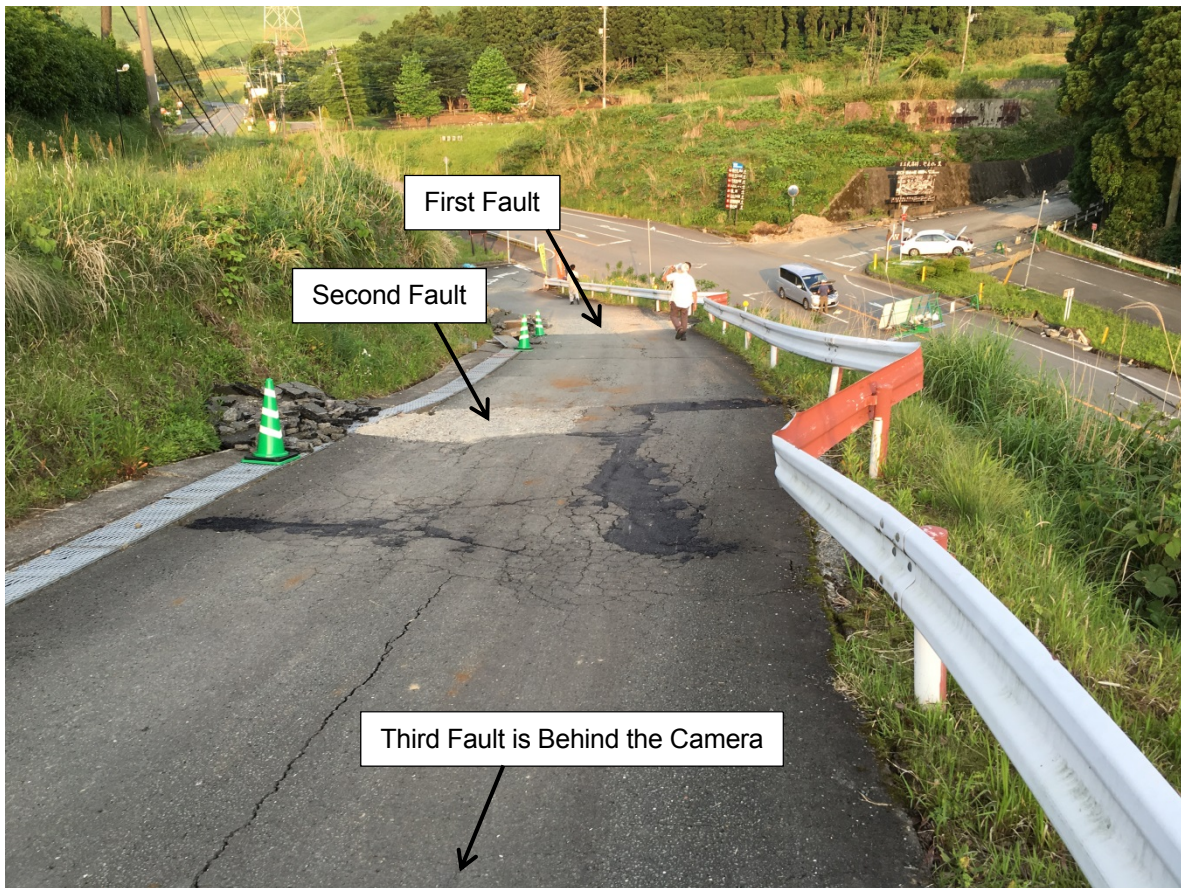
Fault ruptures in the hill above the highway and above the spillway. Note the compressions in the guardrail and road patches.
